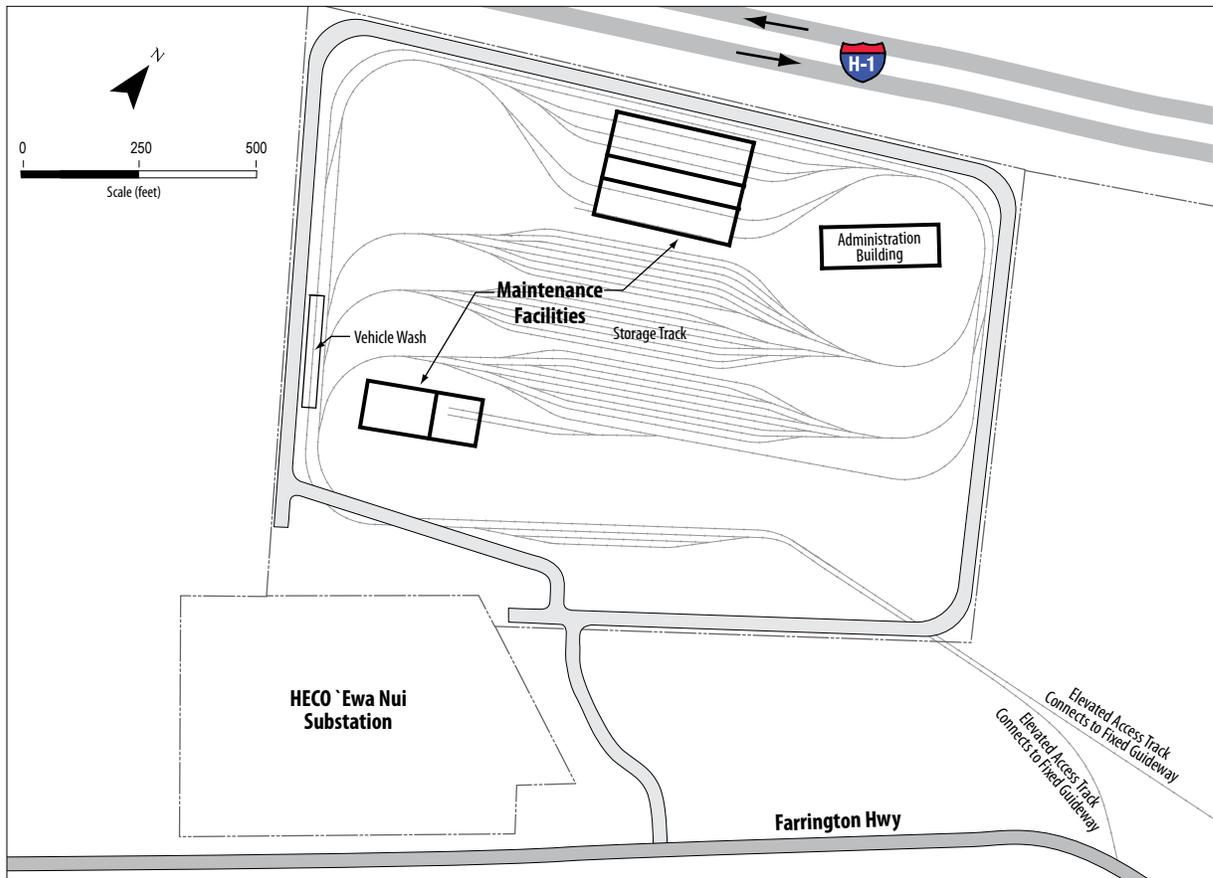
Maintenance and Storage Facility in Ho'opili Location and Conceptual Layout
